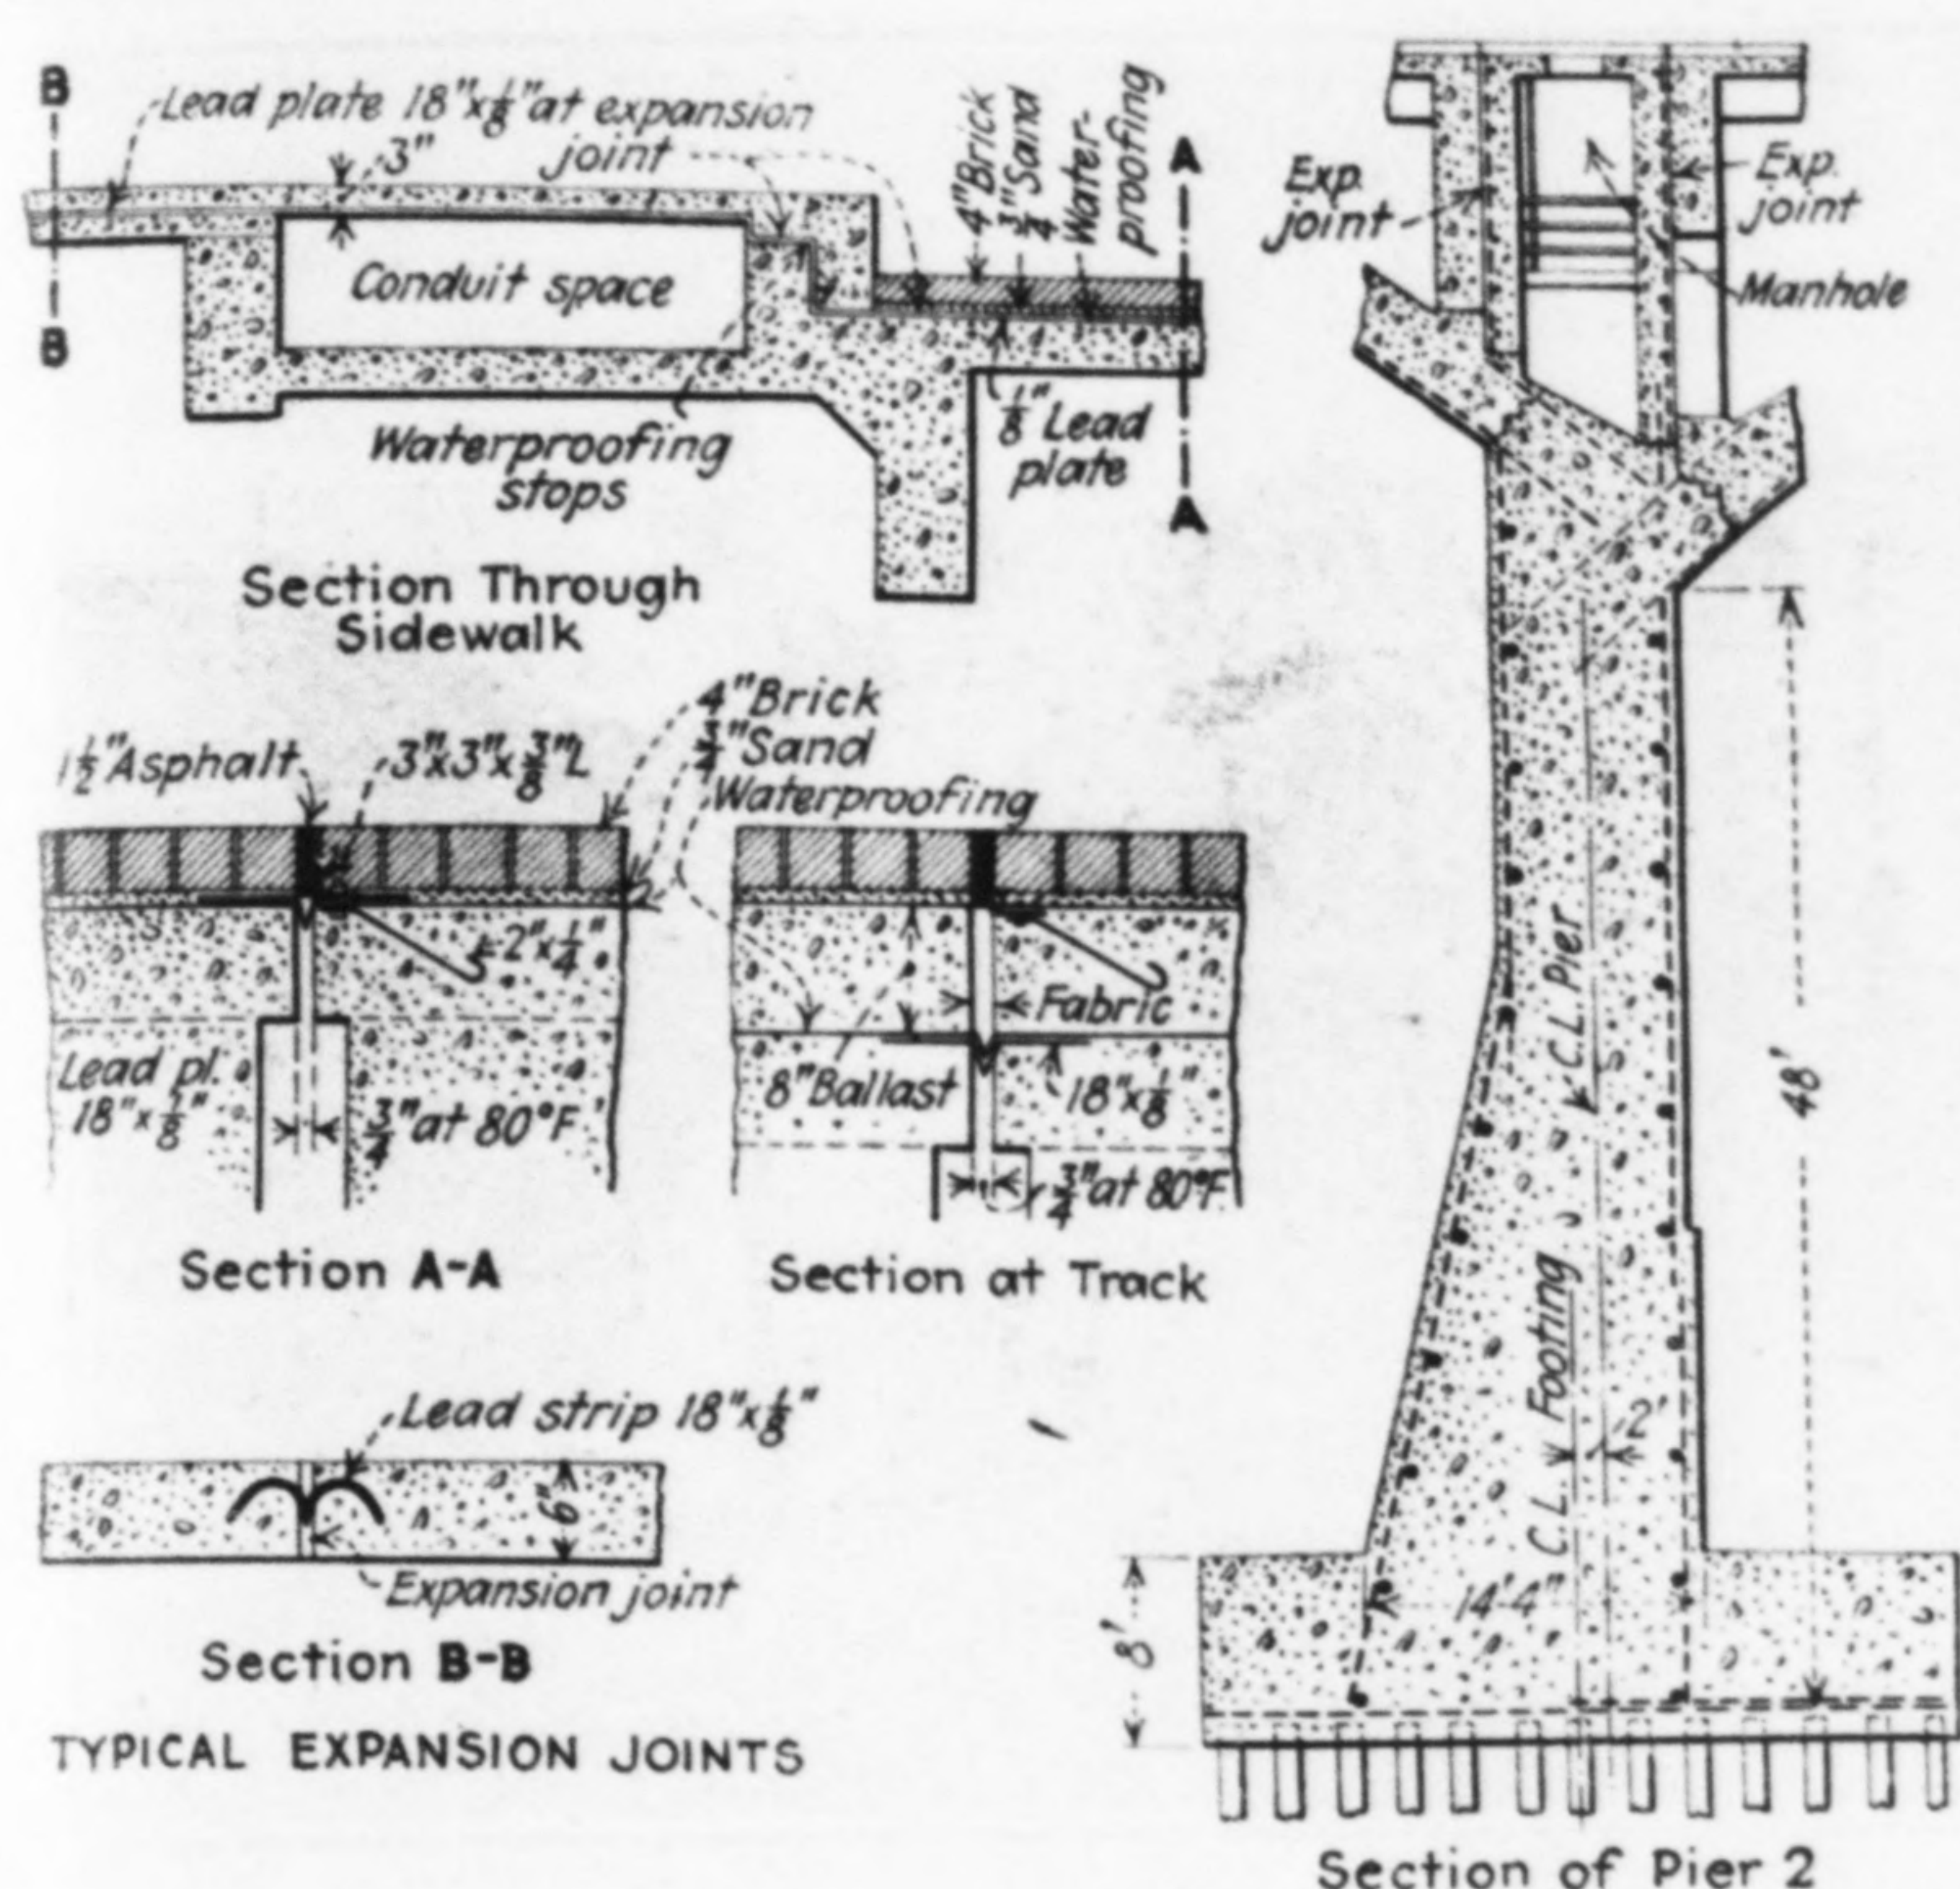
EXPANSION JOINTS AND PIER SECTION
